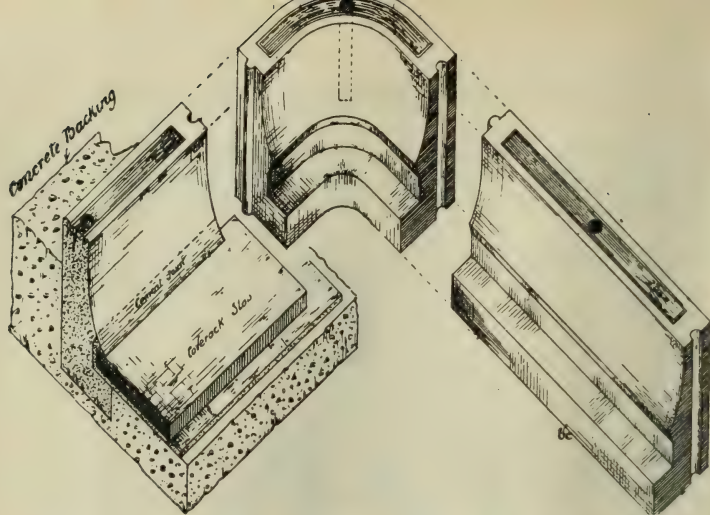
Angle Block and General Method of Construction of Concrete Reservoir: Dean Stone Company.
